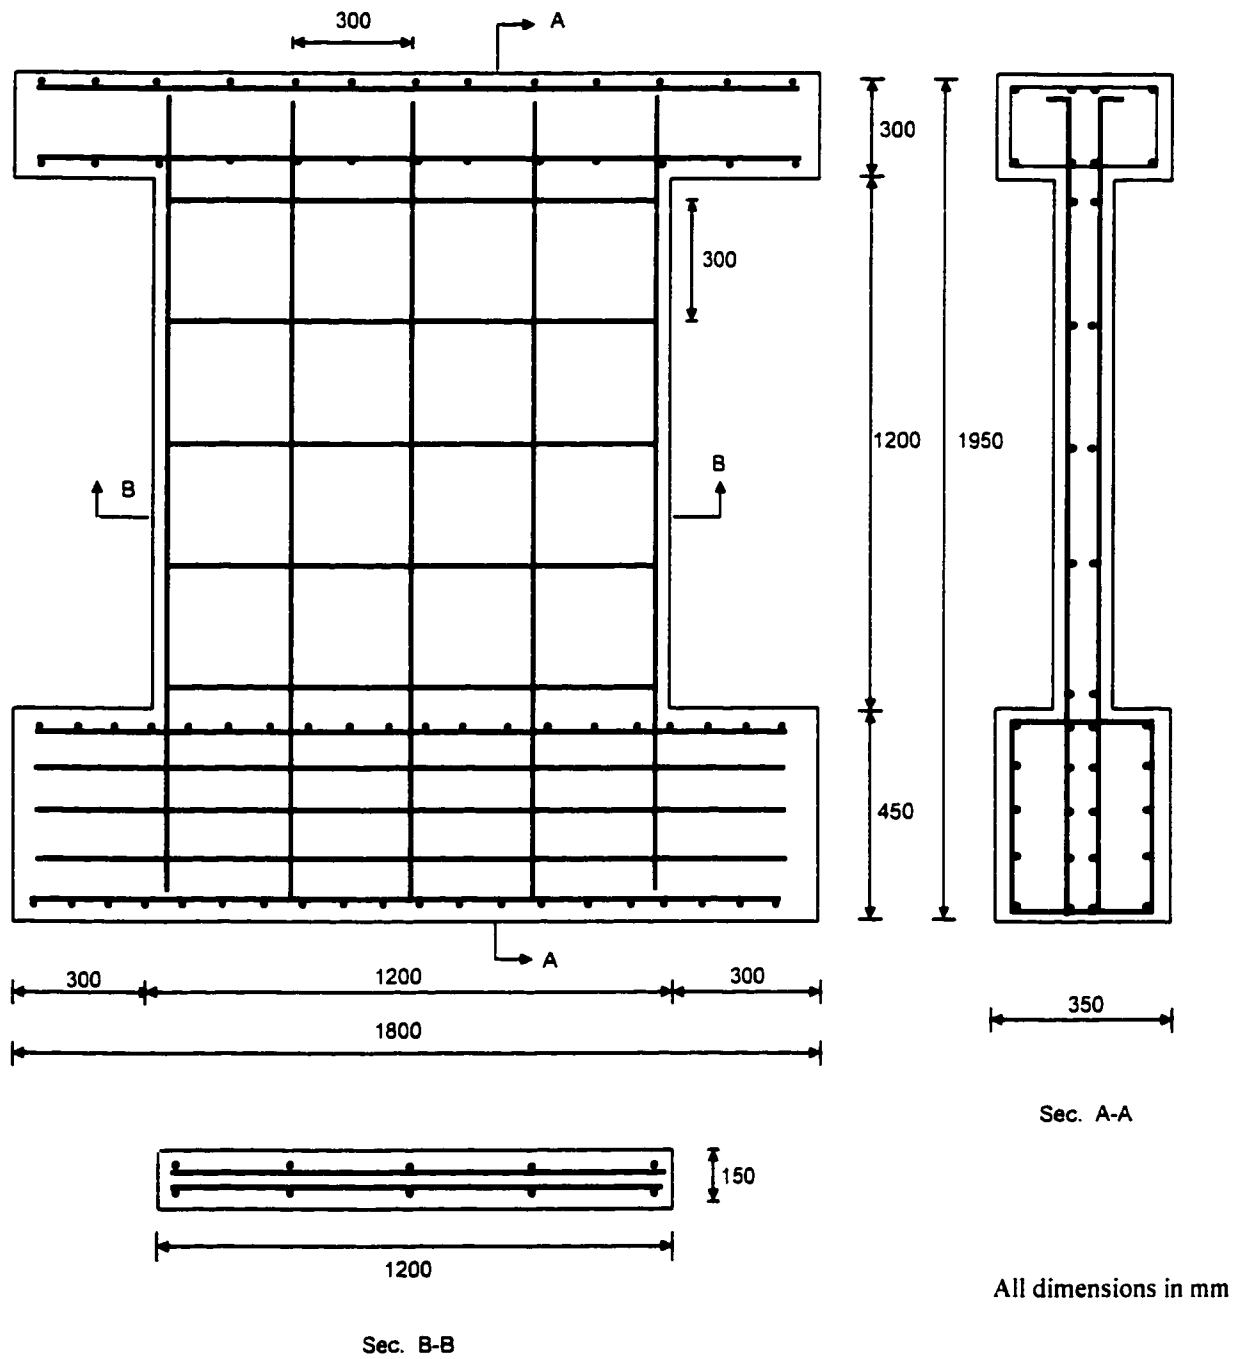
Geometry and reinforcement details of shear wall N1
